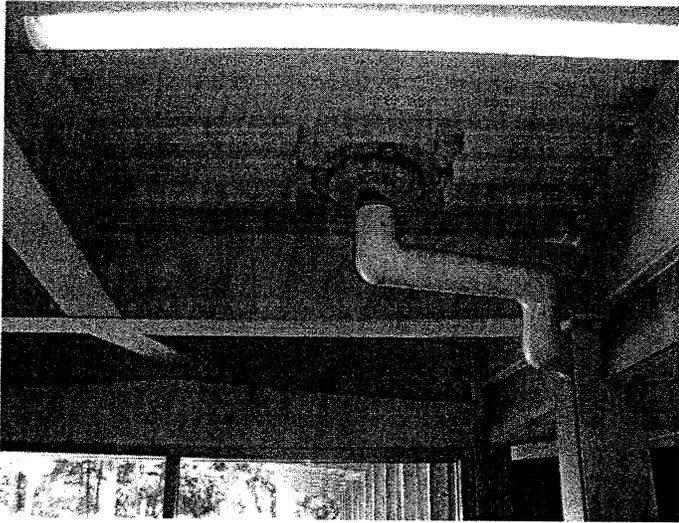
There is evidence of leakage around many of the roof drains. This may be water migrating between the various roof layers. We're recommending the removal, replacement and re-insulation of all roof drains.
